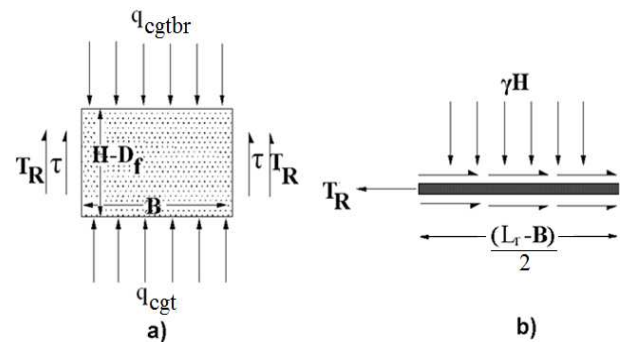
Stresses on (a) reinforced granular column and (b) geosynthetic reinforcement
